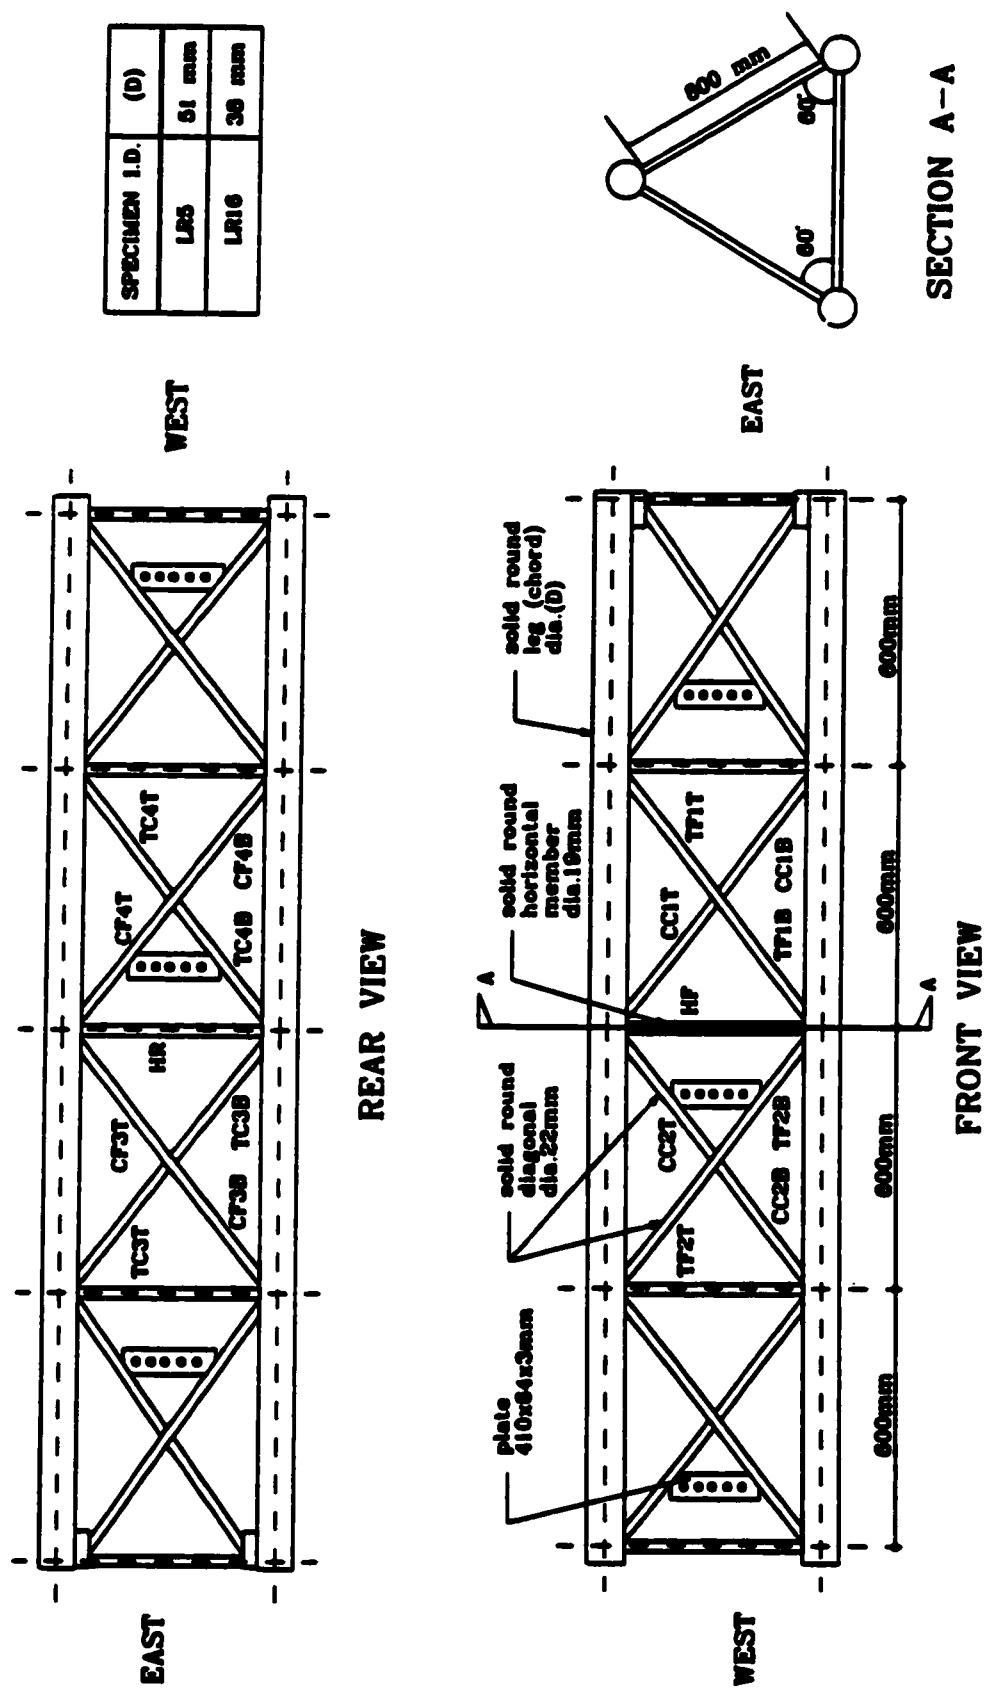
Dimensions of Specimens LR5 and LR16
